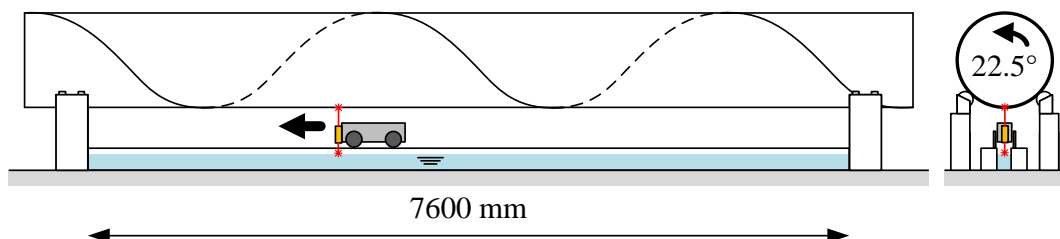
Laboratory test setup to measure initial geometrical imperfections.
